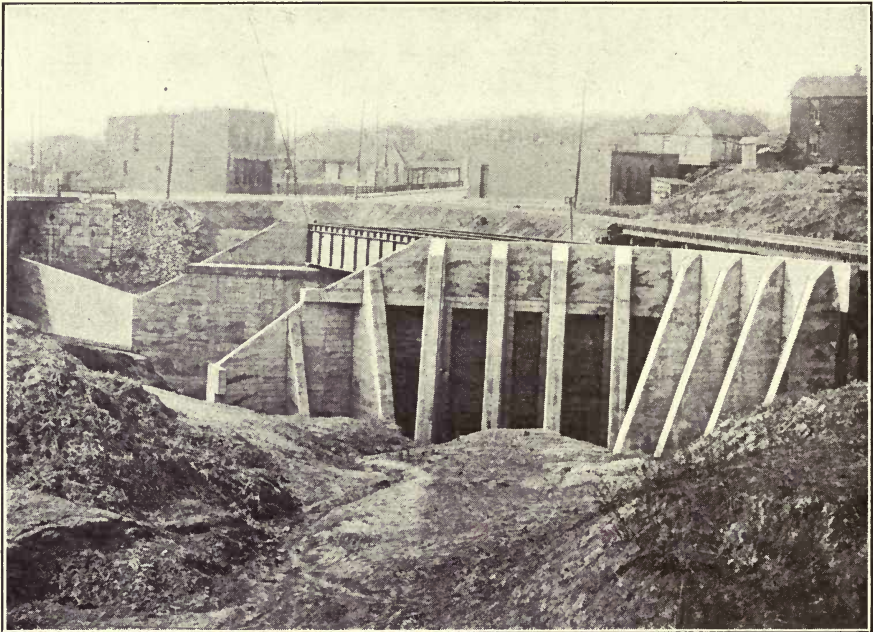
THIRD STREET ABUTMENTS, K. C., M. & O. RY.
